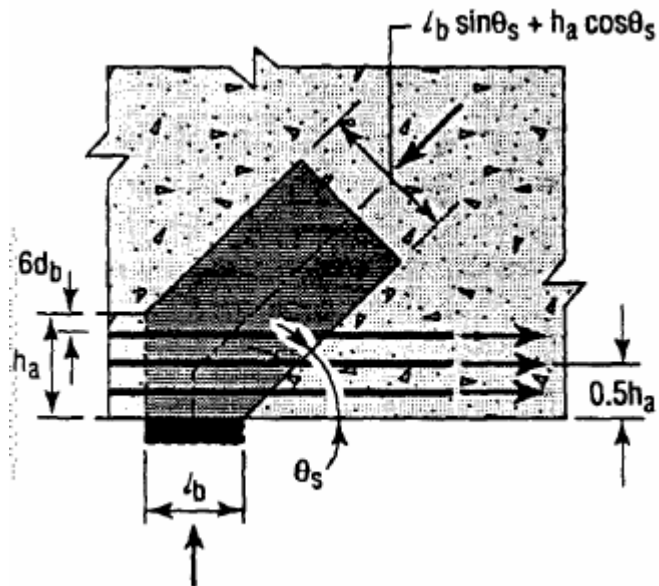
AASHTO LRFD effective area of concrete for strut anchored by bearing and reinforcement
